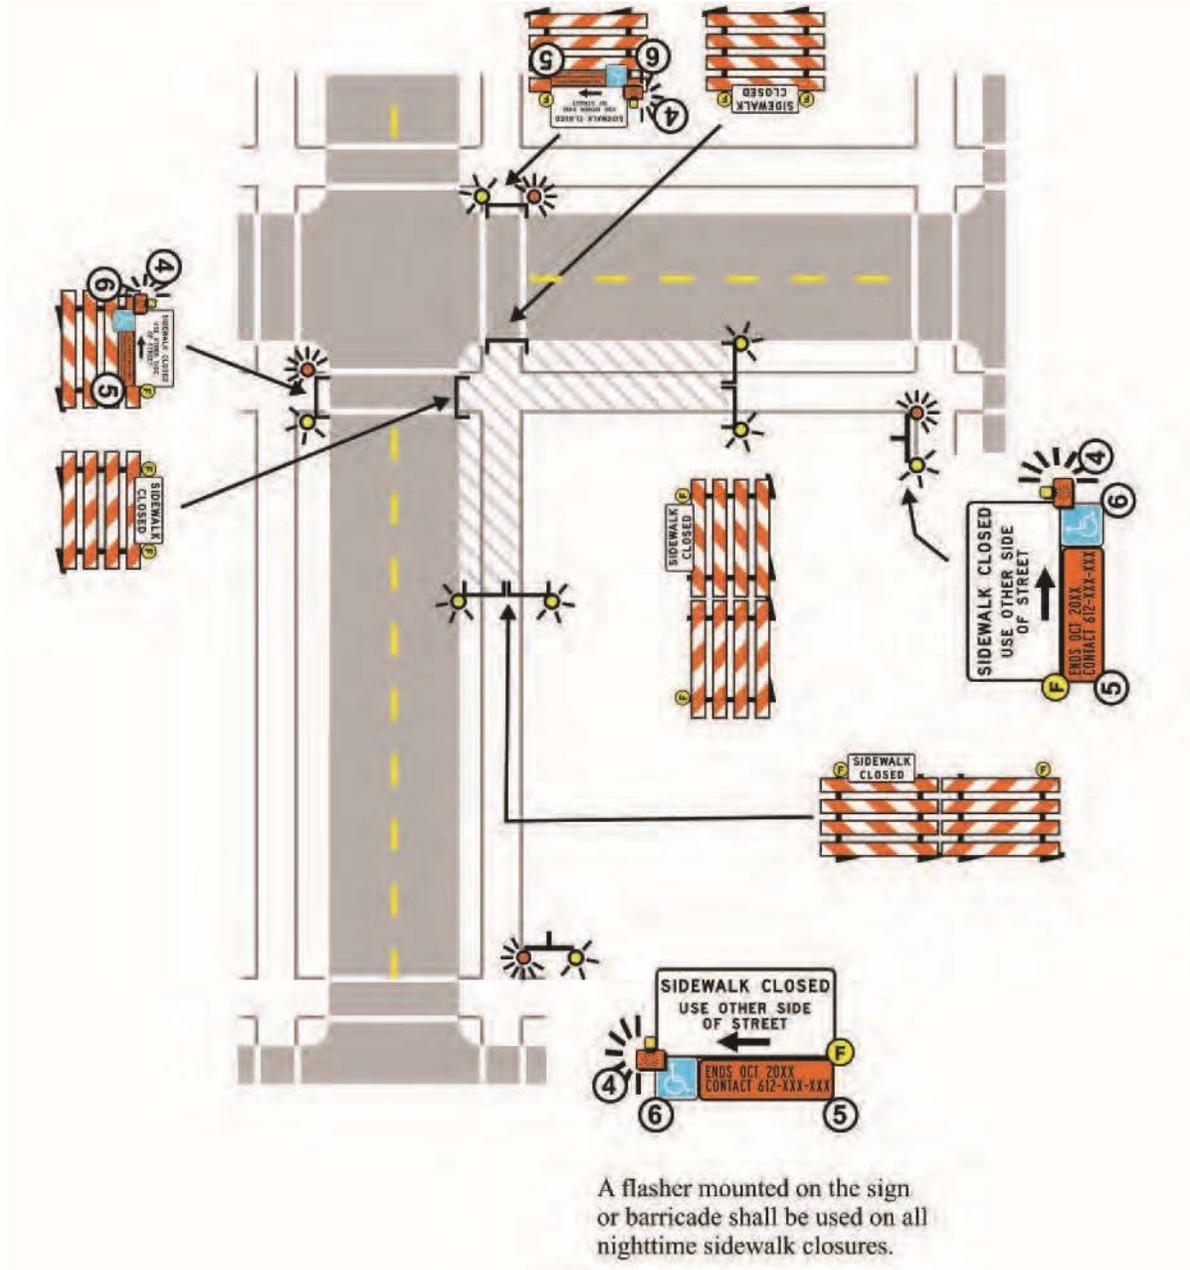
Layout 84B: Crosswalk Closures and Pedestrian Detours
